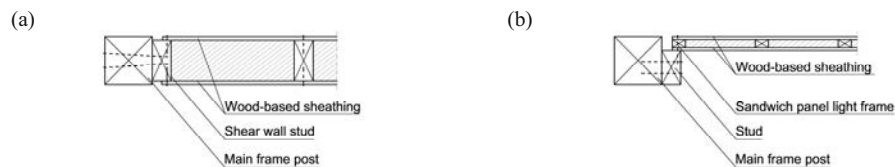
Nailed connections between shear walls and posts: simple shear wall panels (a) and sandwich panels (b).
